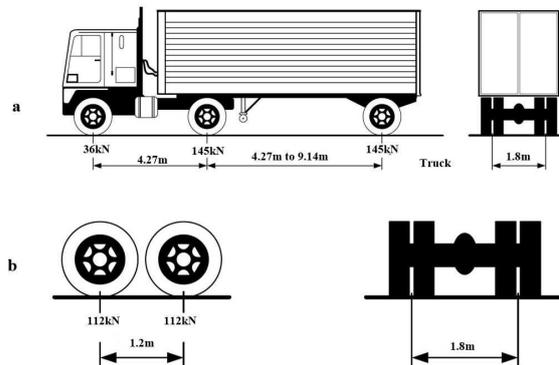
AASHTO LRFD vehicular loading, (a) truck, (b) tandem [5]
